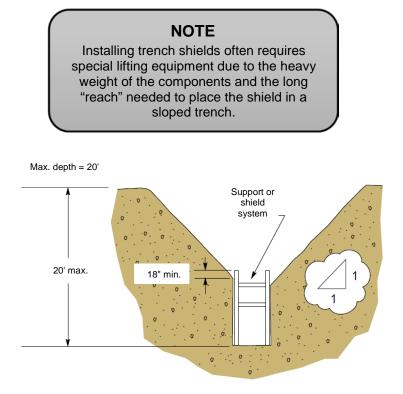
Type B soil: trench shield installed in sloped excavation
